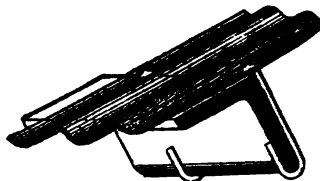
Sheets Fastened to Angle-purlin by Clinch-nails
